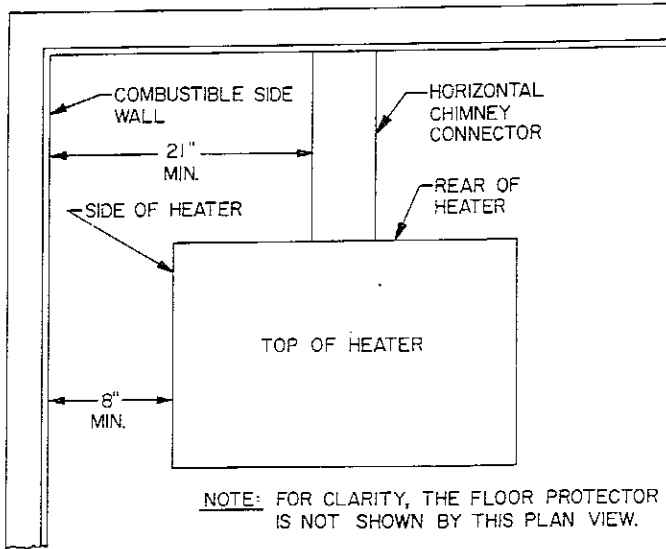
MINIMUM CLEARANCES TO COMBUSTIBLE SIDE WALL. (PLAN VIEW SHOWN, SEE FIGURE 6 FOR SIDE VIEW.)
